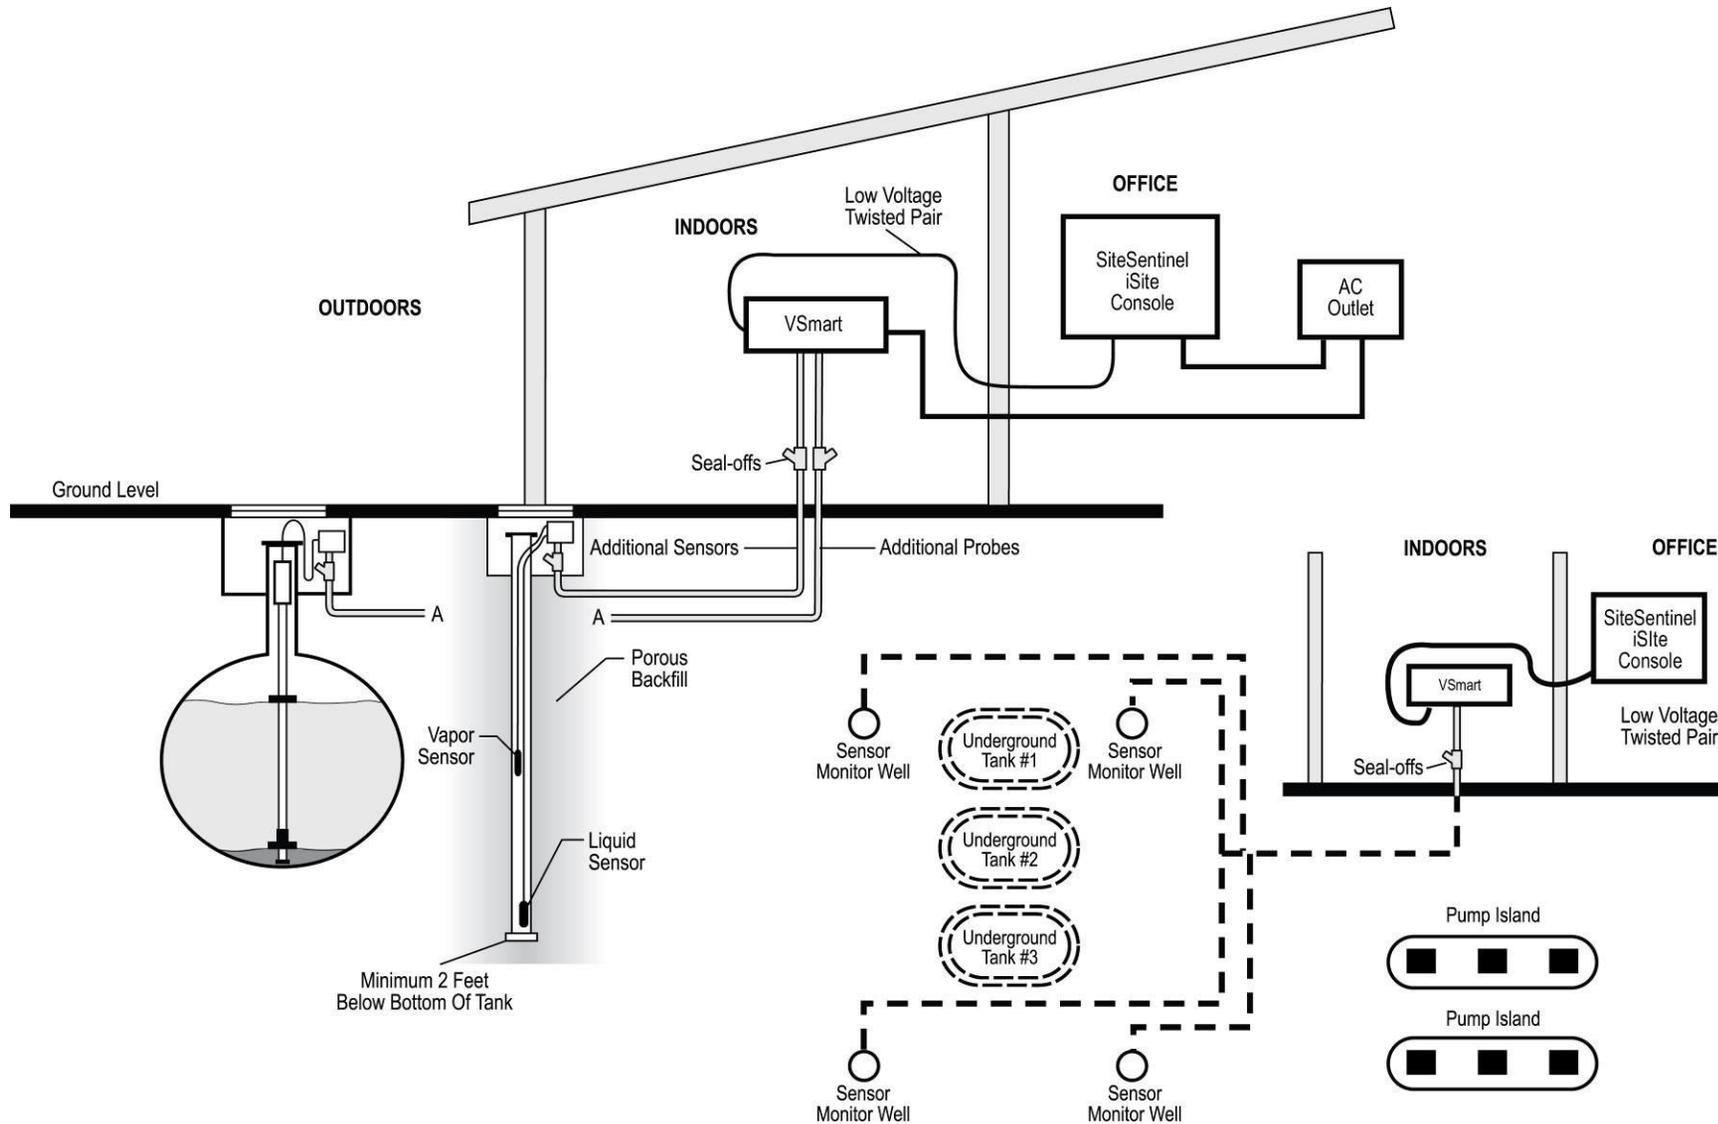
Dry-Well Monitoring, Single-Wall Tank
